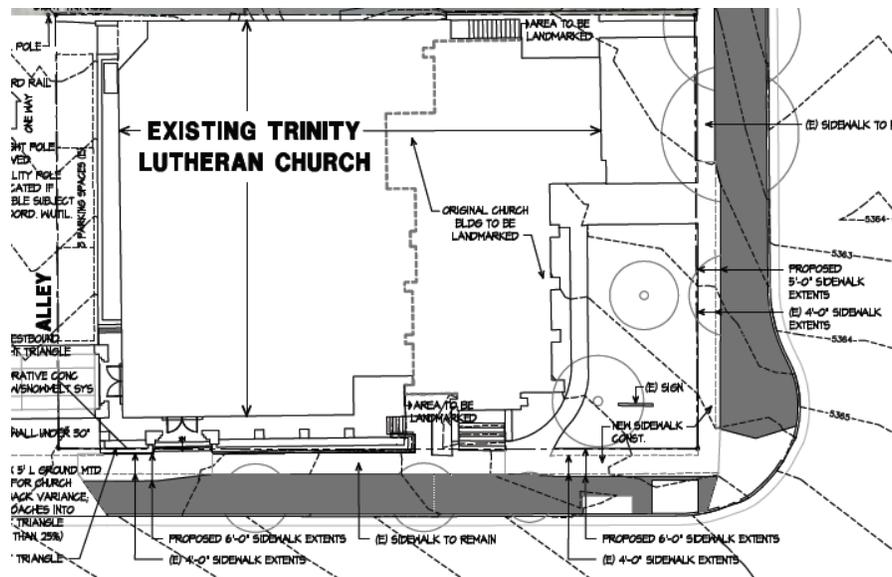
Sheet A1.00, landmark boundary as approved by Planning Board May 1, 2014 as a condition of Site Review.
